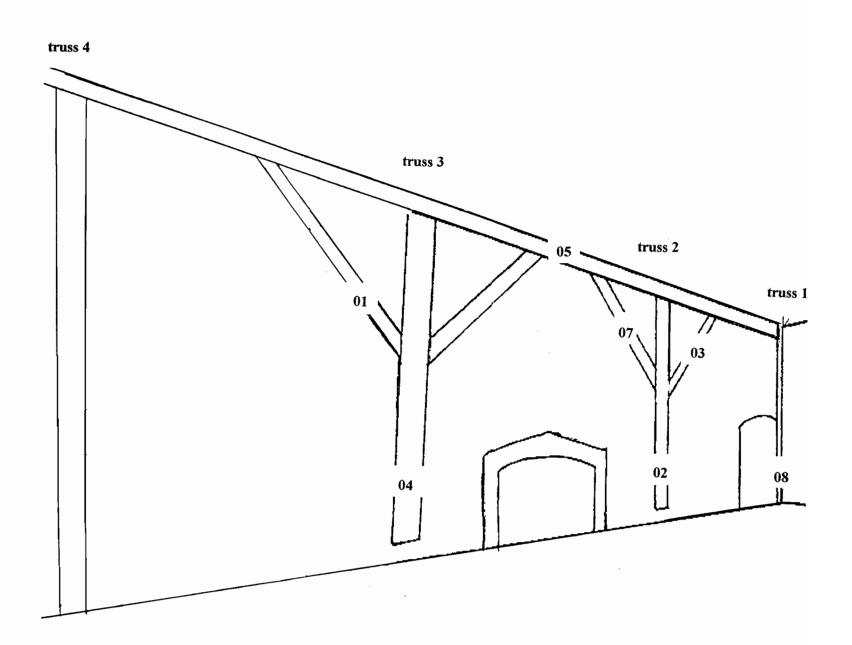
Sketch drawing of timbers in the east wall of the Keep to show position of samples
